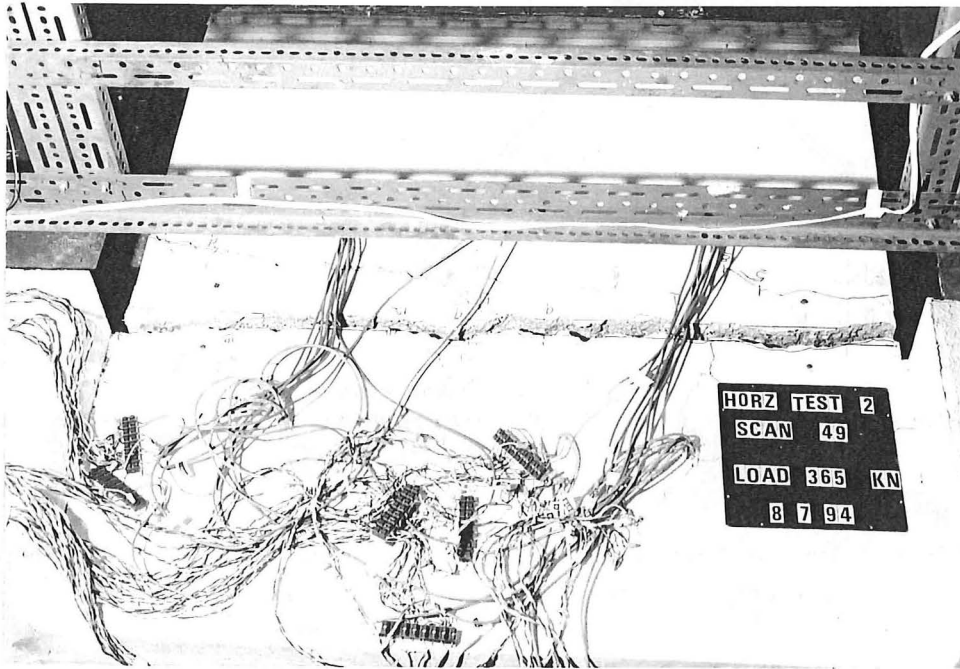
Well defined crack opening through the support construction joint
